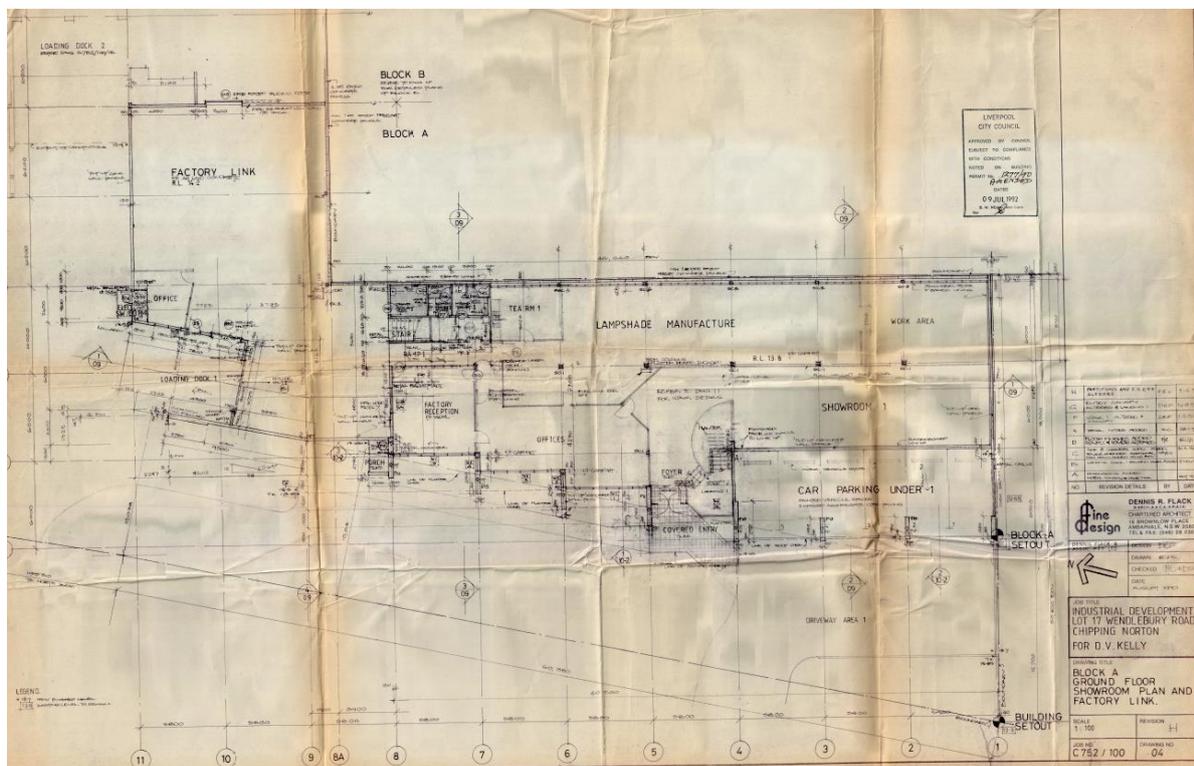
Extract of the approved ground floor showroom plan and factory link under no. 211/1990
